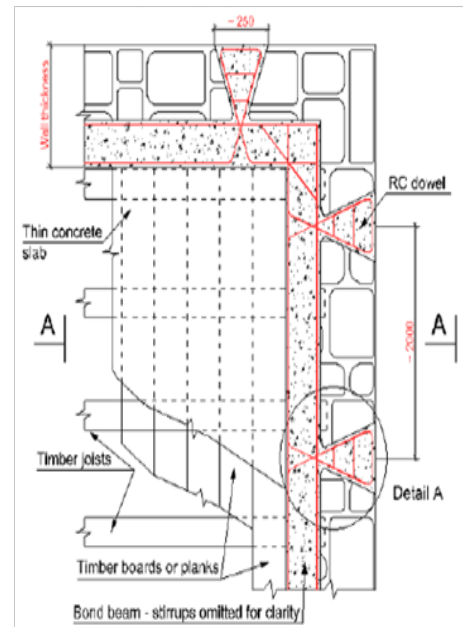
New reinforced concrete slab stiffening the subfloor structure and anchoring to the existing walls with reinforced concrete wedges.
